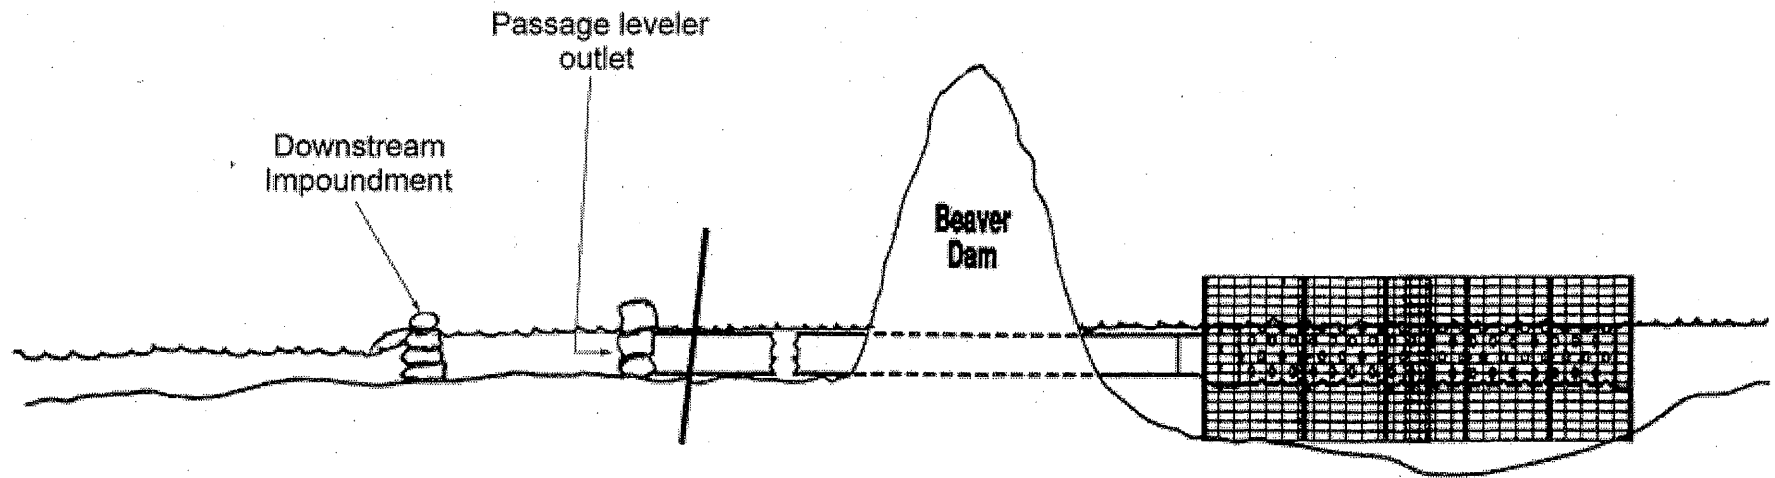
A leveler installation showing the down stream impoundment to submerge the outlet and control the upper pond water level.
